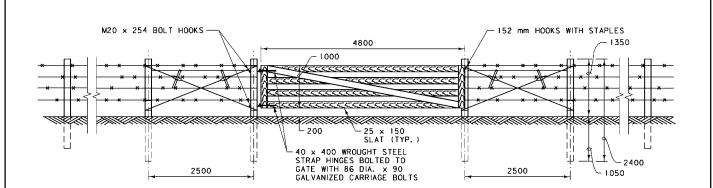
DETAILED DRAWING REFERENCE STANDARD SPEC. SECTION 607 DWG. NO. 607-15
